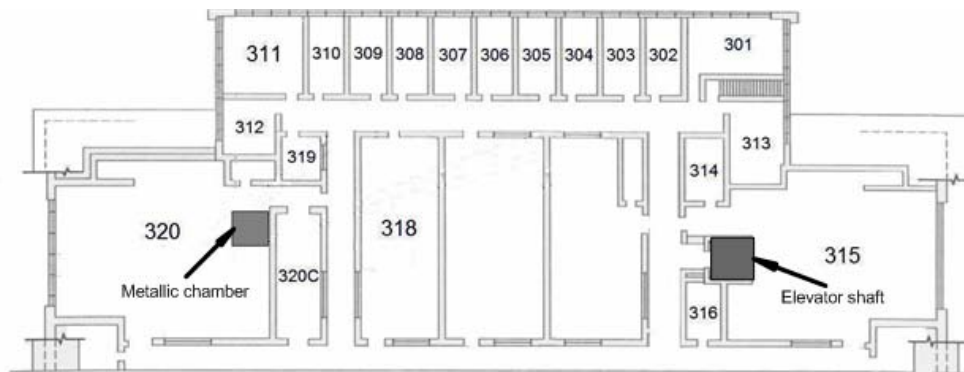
Floor plan of the third floor of the *AK Labs* used for conducting wideband measurements - The locations of the metallic shafts are pointed out in the floor plan
